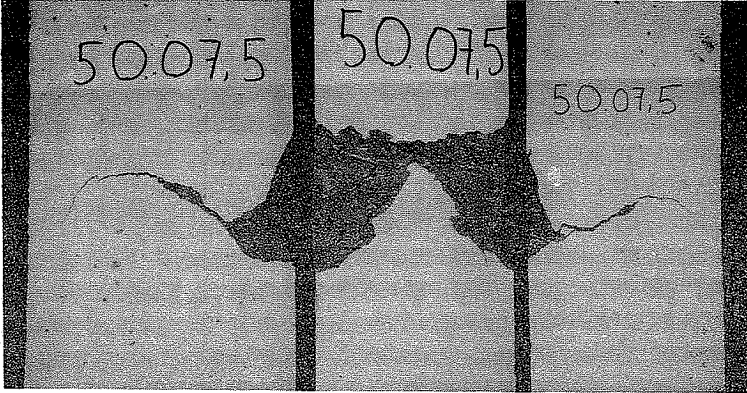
Failure of S.B.-specimen No. 50/07.5.
